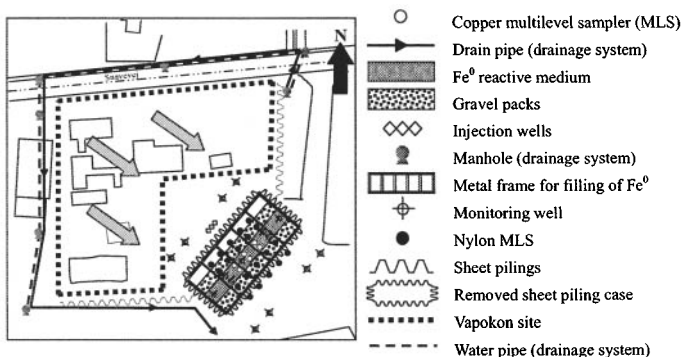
Schematic diagram of the funnel-and-gate Fe^0 PRB installed at Vapokon site, Denmark, and the distributions of the monitoring wells, nylon and copper multilevel samplers over the Fe^0 PRB (adapted from Lai et al. 2006a)
